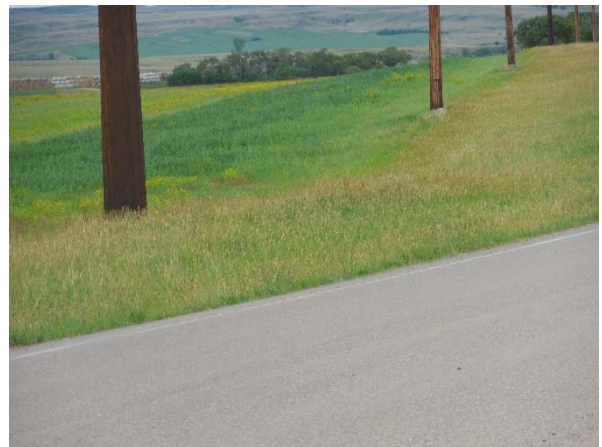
Pipeline corridor restoration area from Highway 16, facing south southeast.
